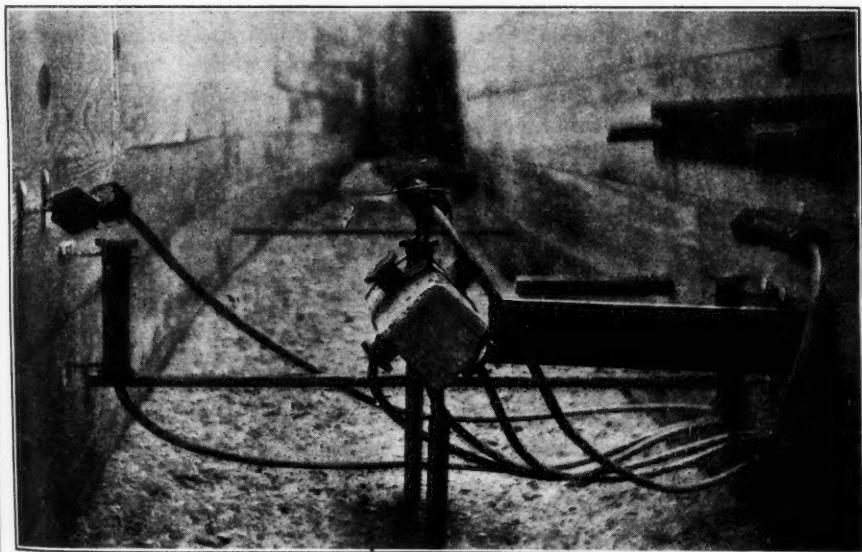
TELEMETER STATION 12, ELEVATION 20. CONCRETE PREPARED FOR CONSTRUCTION JOINT, STEVENSON CREEK TEST DAM.
